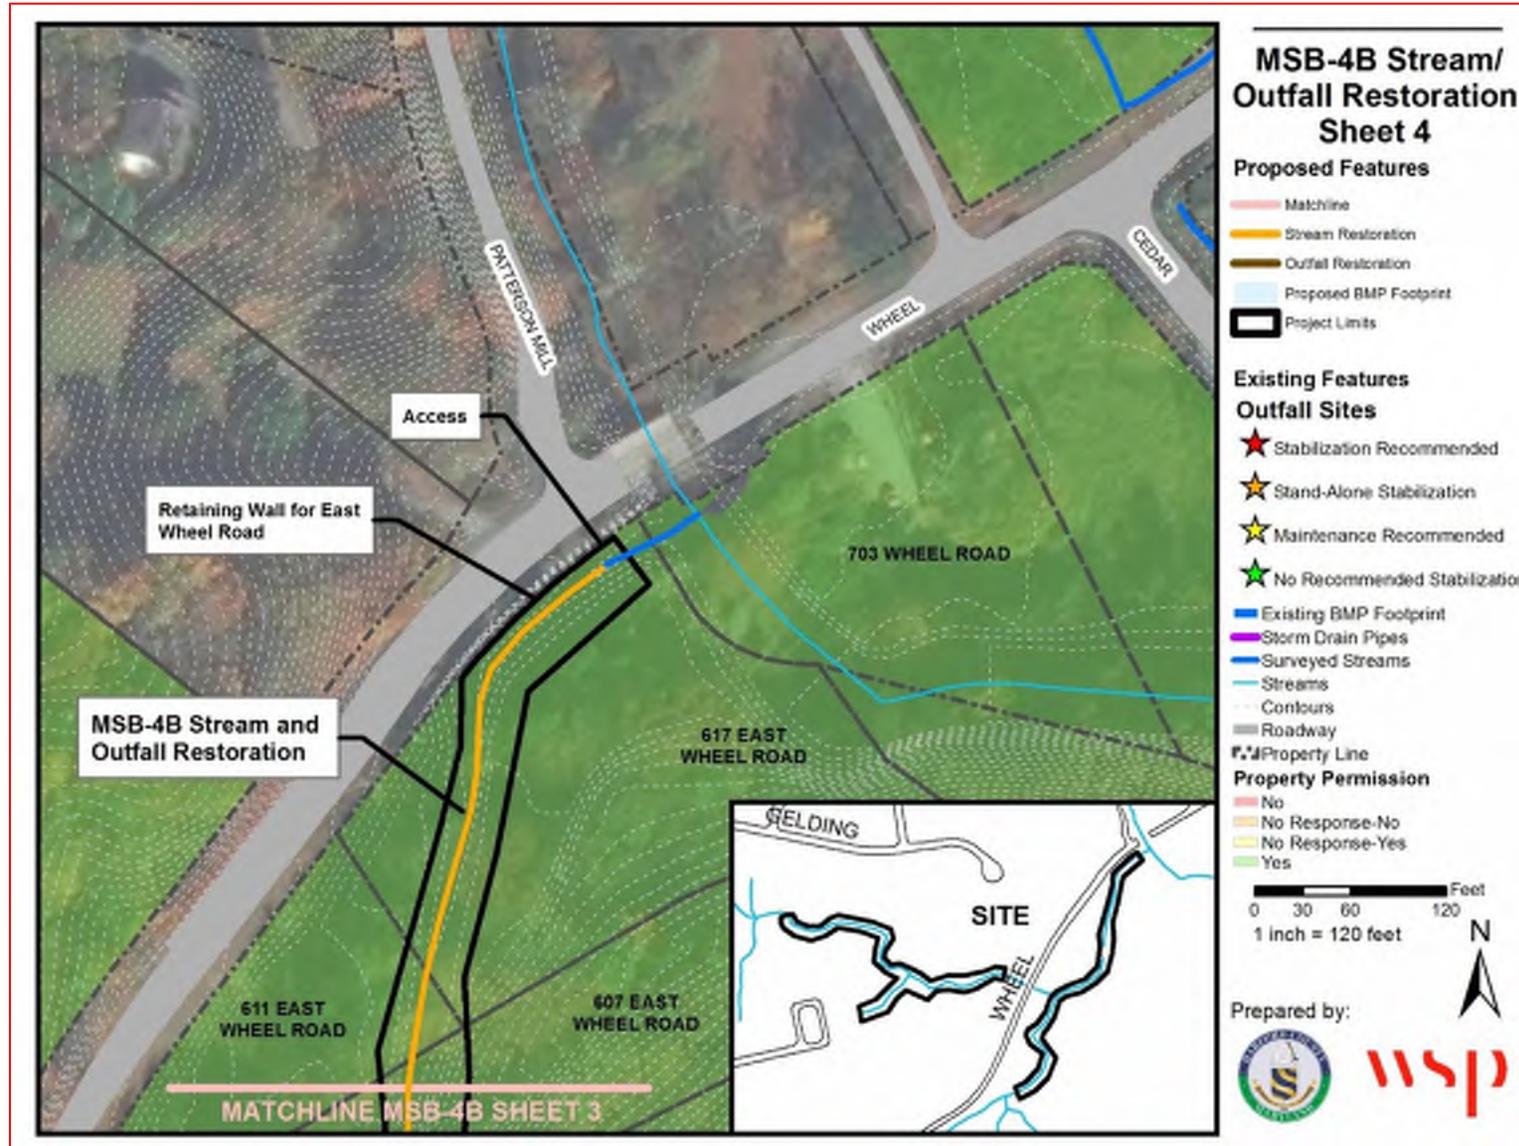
Site Location and Proposed Project Plan for MSB-4B Stream and Outfall Restoration (Sheet 4 of 4)
